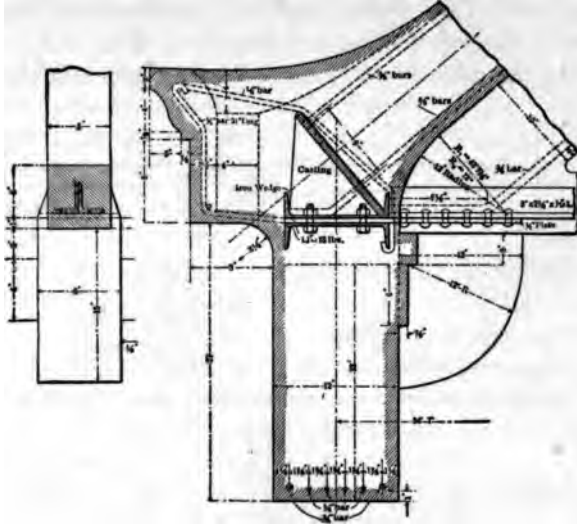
Tie Rod Construction for Arched Roof, Taylor-Wilson Mfg. Co's Shops.
